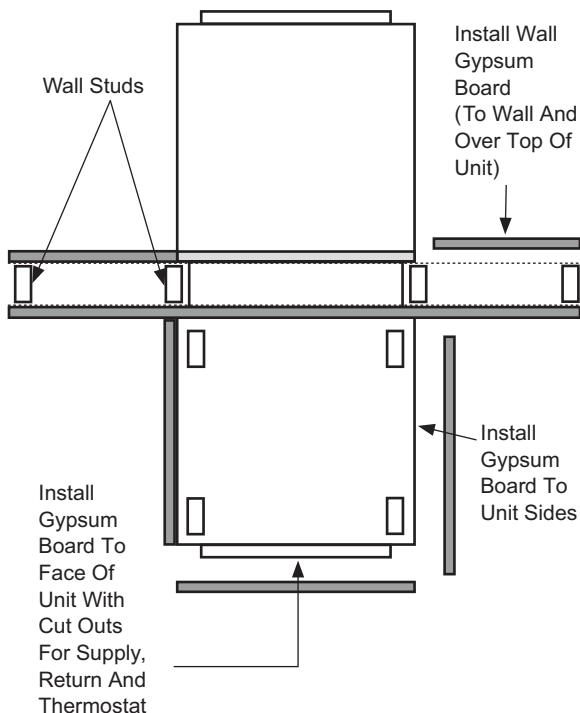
42SJA/SJB Wall Board Installation
